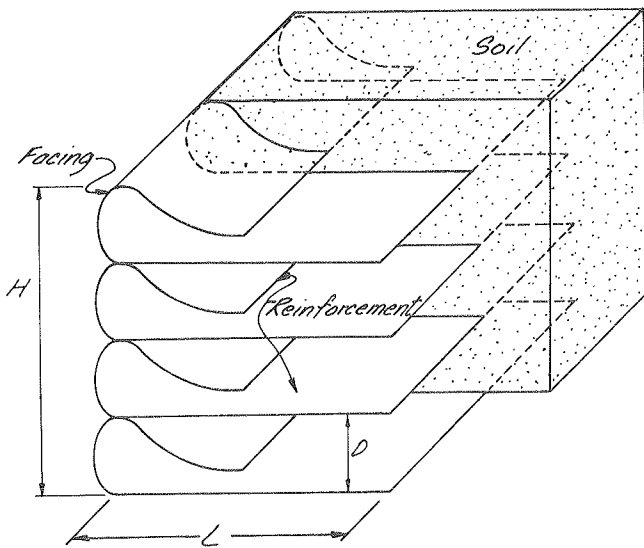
Schematic diagram of a reinforced soil wall using geotextile sheet reinforcements.
